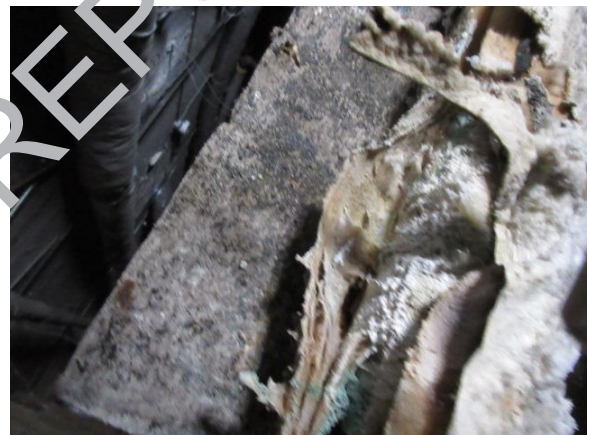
SUSPECTED ASBESTOS PIPE LAGGING
